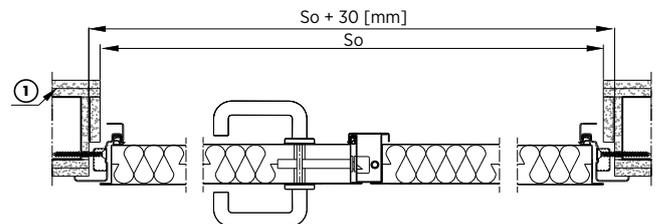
Installation of the double-leaf door with the corner frame in a masonry wall, horizontal cross-section
